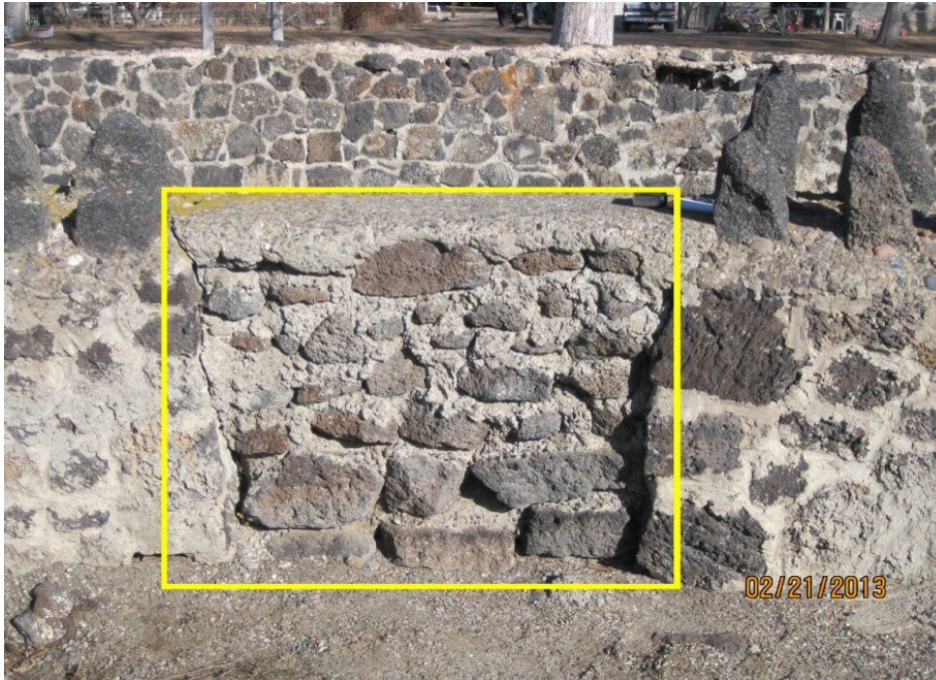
Repaired Section Utilizing Stone and Grout to Rebuild Parapet Wall
